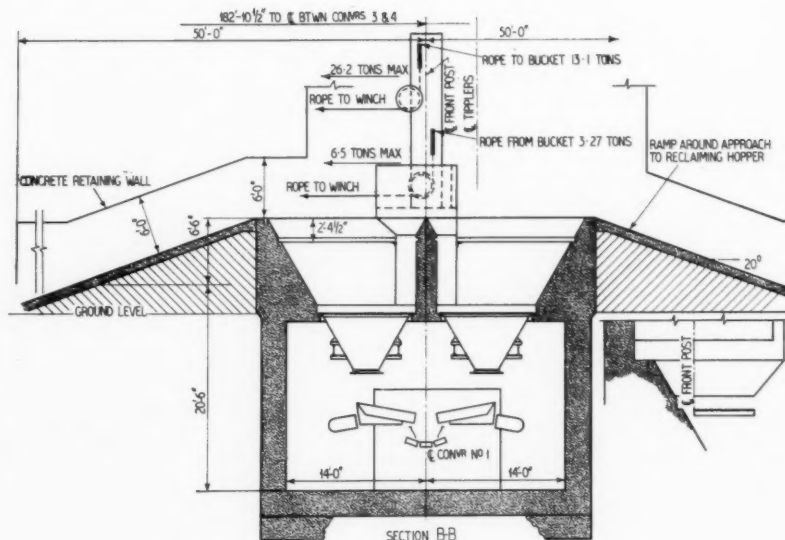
(above and below) Details of tippler and reclaiming pit construction
